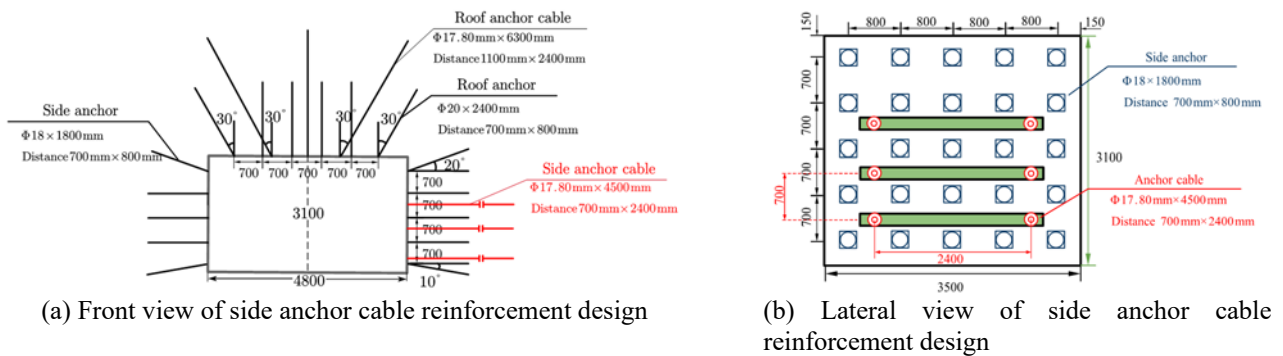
Diagram of anchor cable reinforcement of mining roadway
